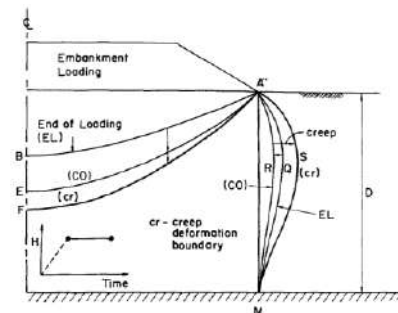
Deformation Pattern of Embankment Foundation at End of Consolidation Stage
